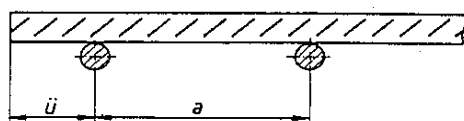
Pitch of longitudinal or cross wires and overhang of single wires
